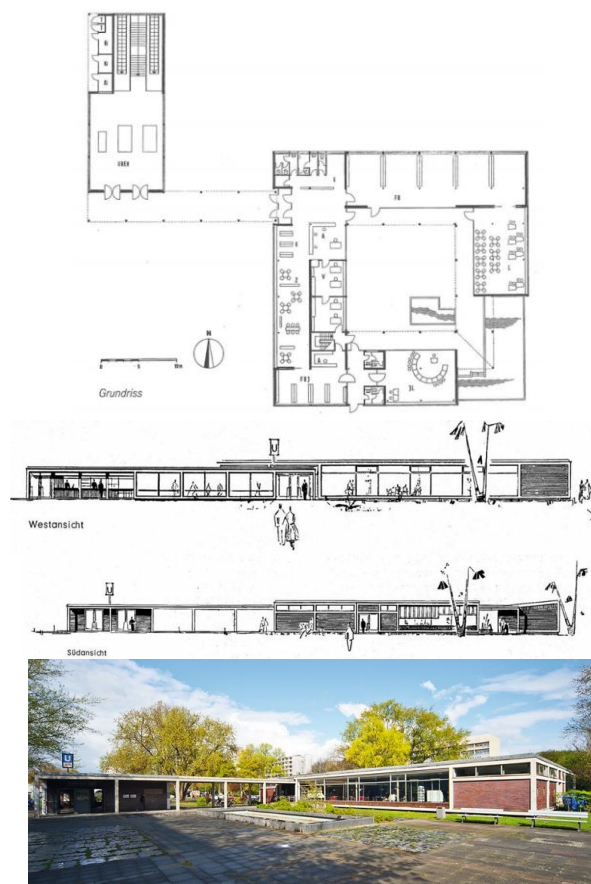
Building no.23 Entrance to the Hansaplatz subway station and Hansa Library floor plan
